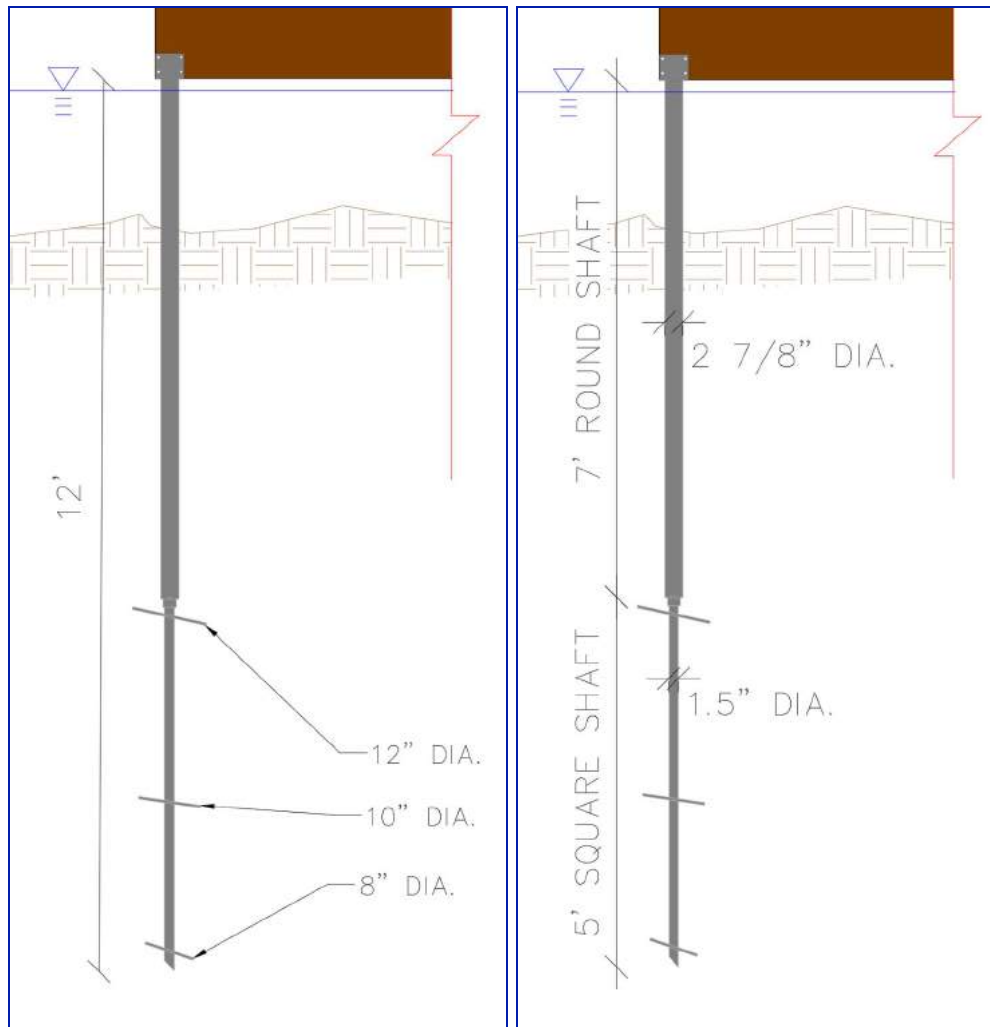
Boardwalk Helical Pile Dimensions: Plate dimensions-left, Shaft(s)-right.
